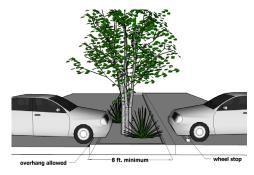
C: Minimum width of interior parking lot landscape areas
